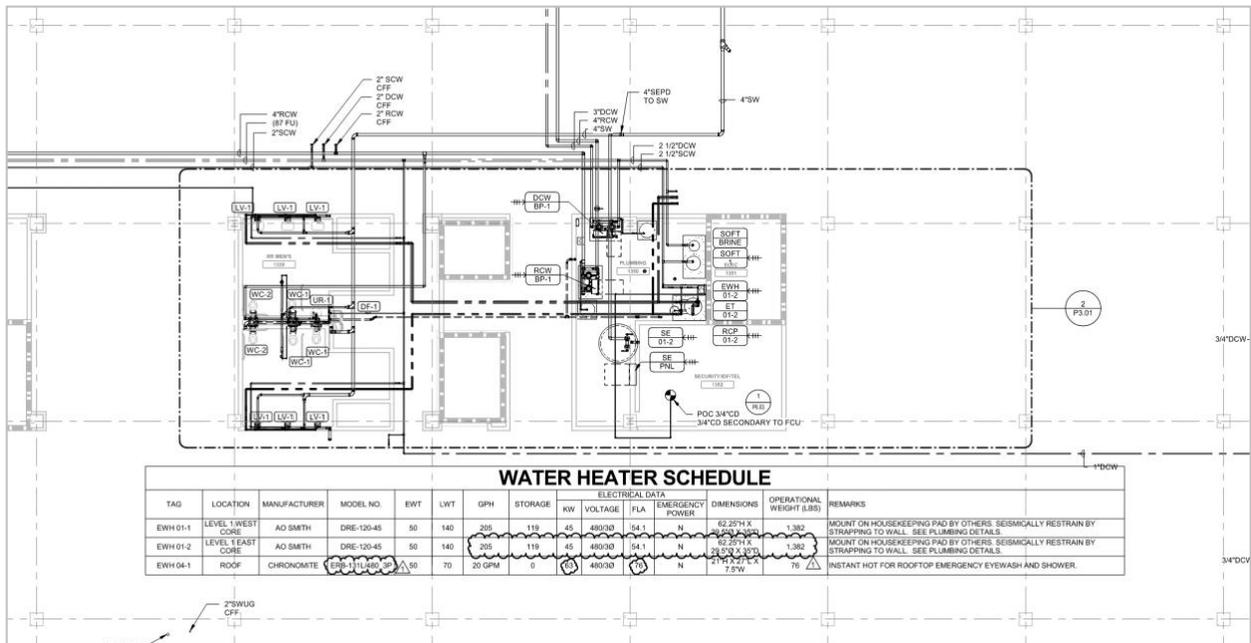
Typical Plumbing Drawings Showing EWH Location and Schedule
